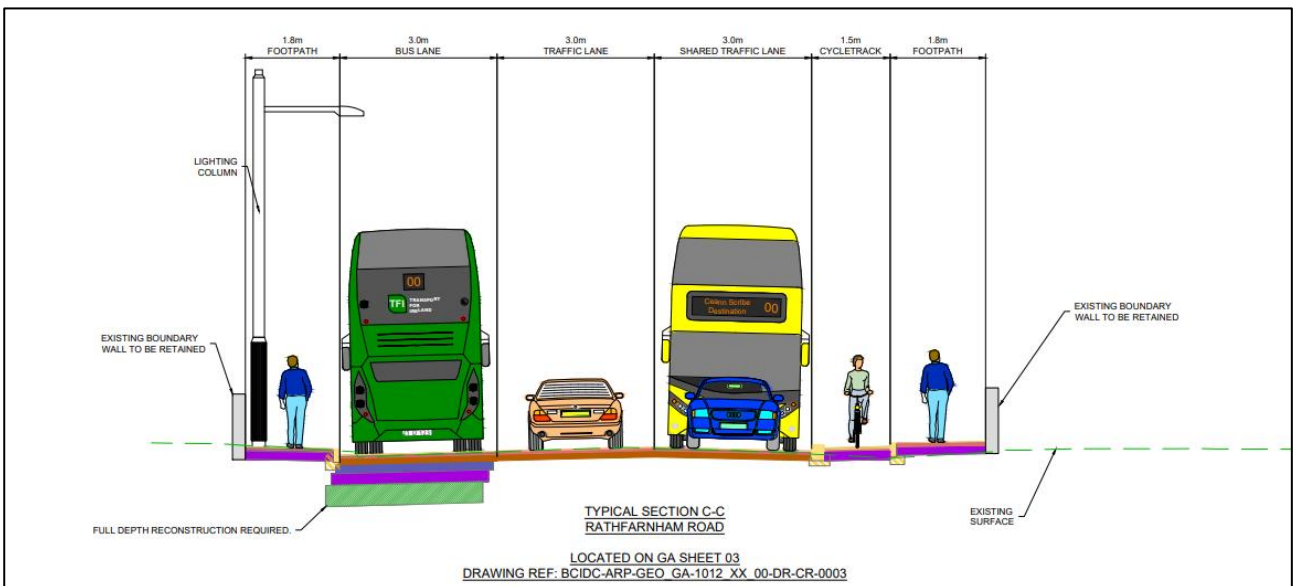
Typical Cross-Section adjacent to 1 Main Street
